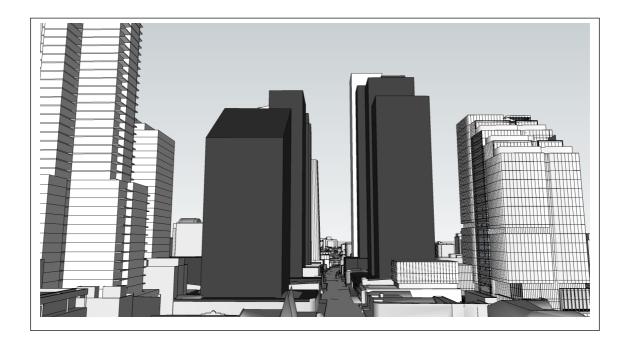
12m upper level (tower) setback - looking north towards the River
